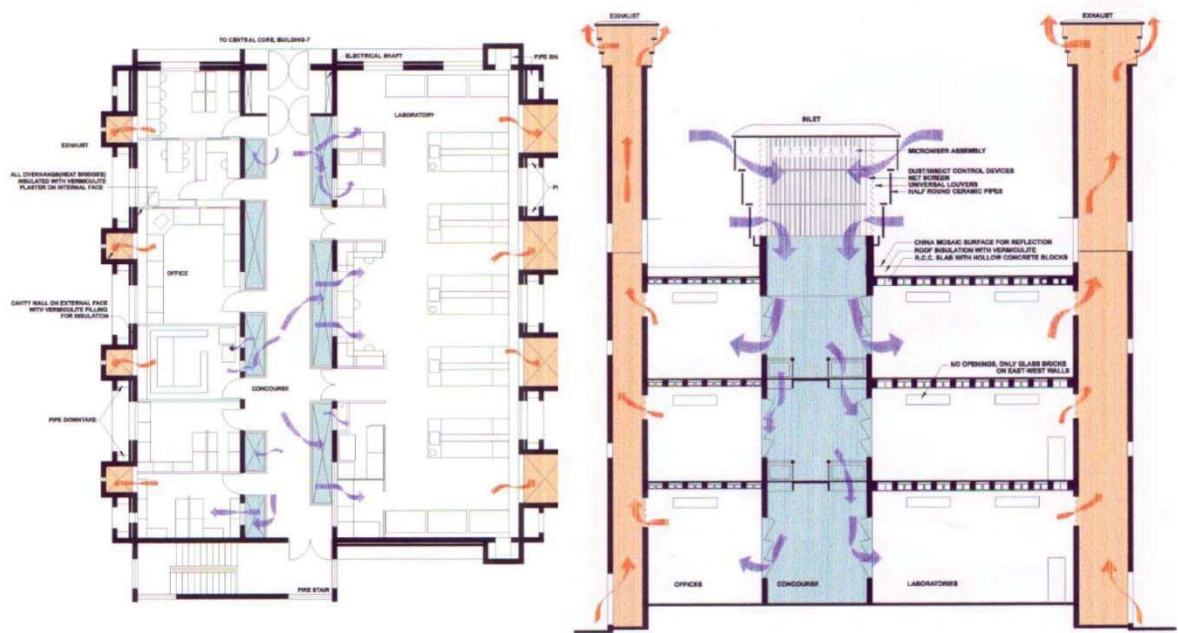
(Left) First Floor Plan (Right) Section.¹⁸
